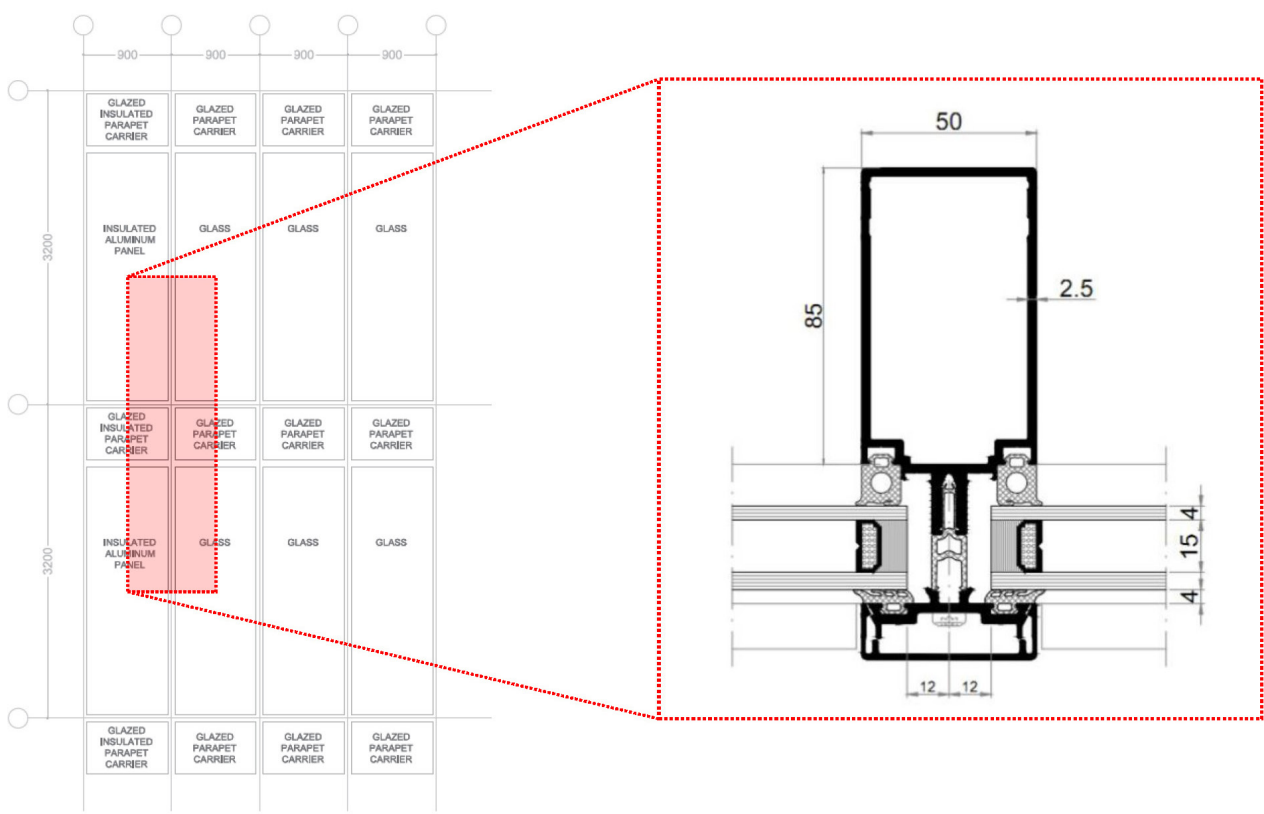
Standard curtain wall elevation for study (Source - Author)
